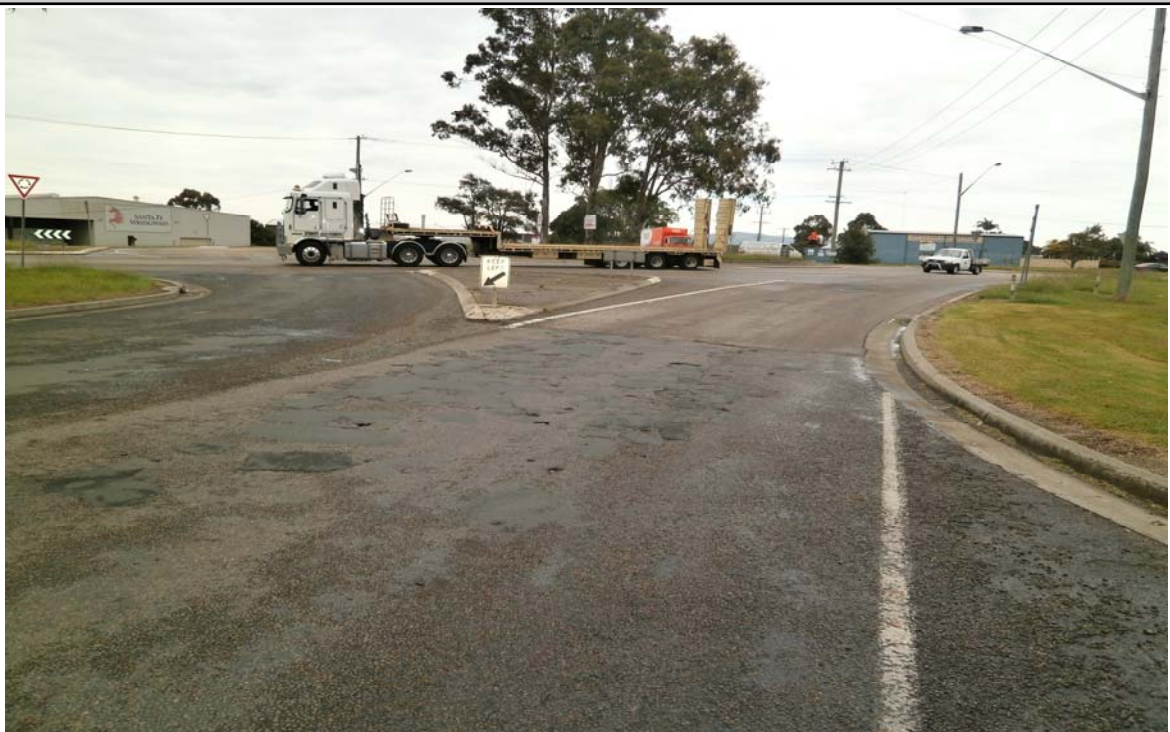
OLD PUNT ROAD NORTH OF ROUNDABOUT. PAVEMENT POOR CONDITION ON NORTHERN DEPARTURE.
